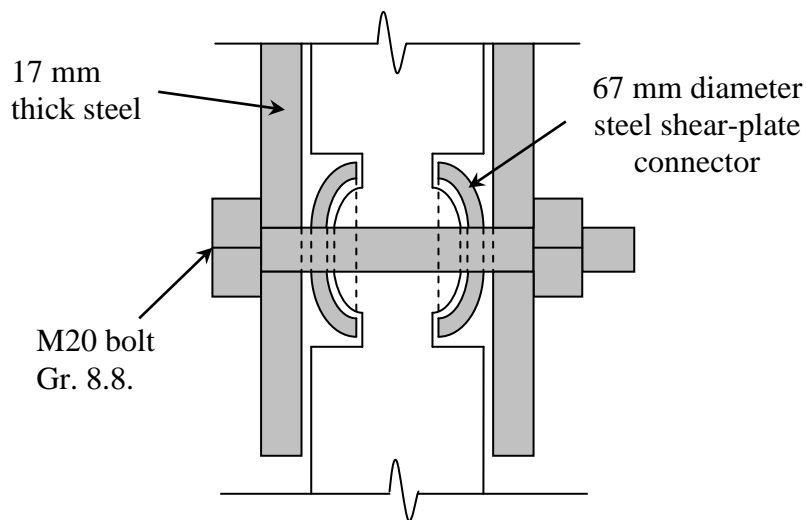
Detail of clamping arrangement to the upper timber sample in figure 4a
